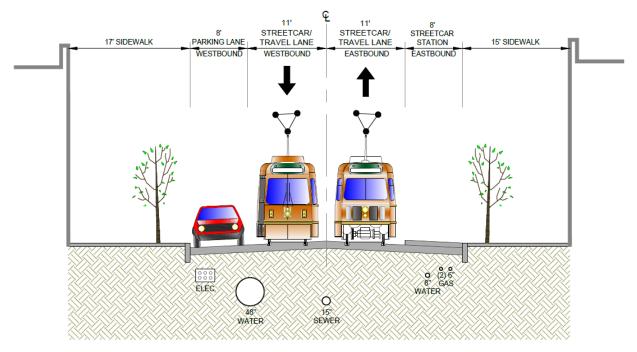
Typical Cross Section along Van Brunt Street (at Hamilton Avenue)
